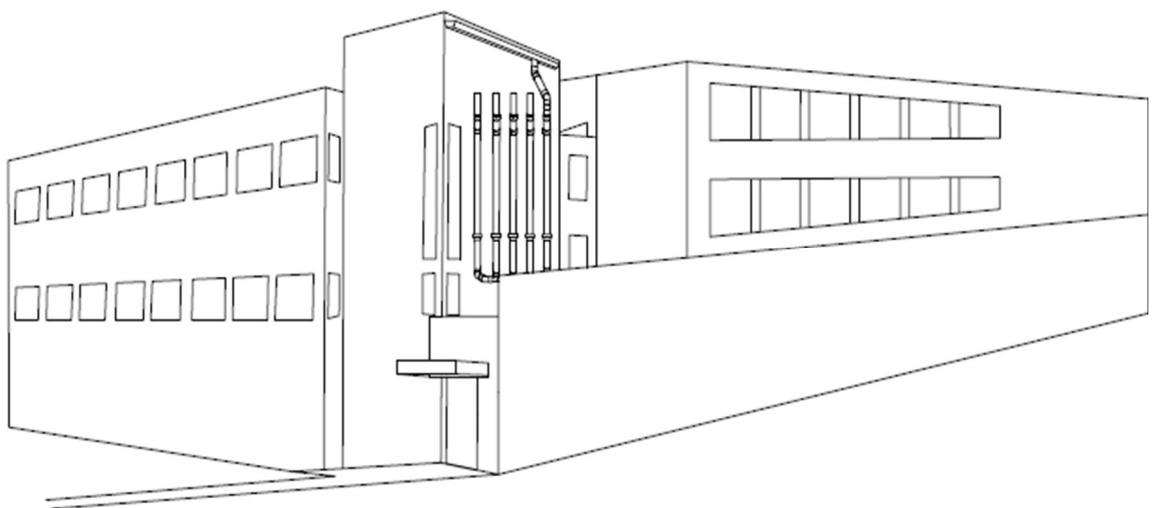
Proposal of construction of a Water Wall on the building of the Department of Civil Engineering (FCTUC), in Coimbra, Portugal.
